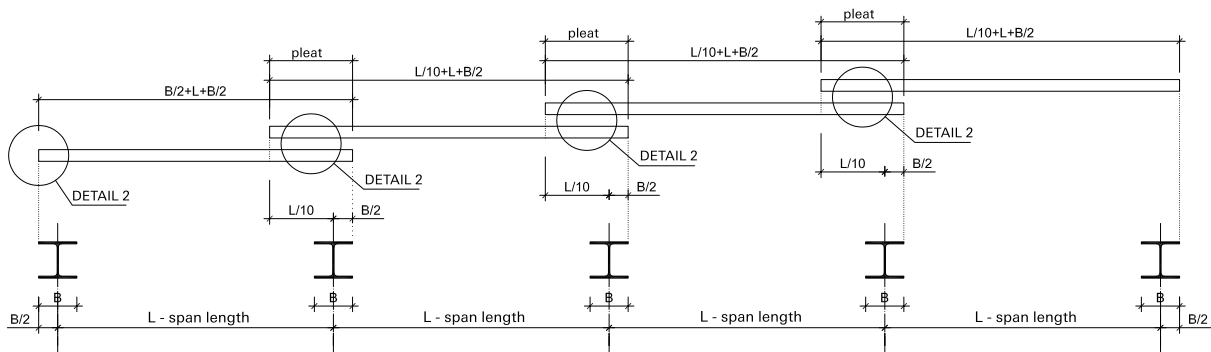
Installation of sheets with a double joint reinforcement over the intermediate support.
